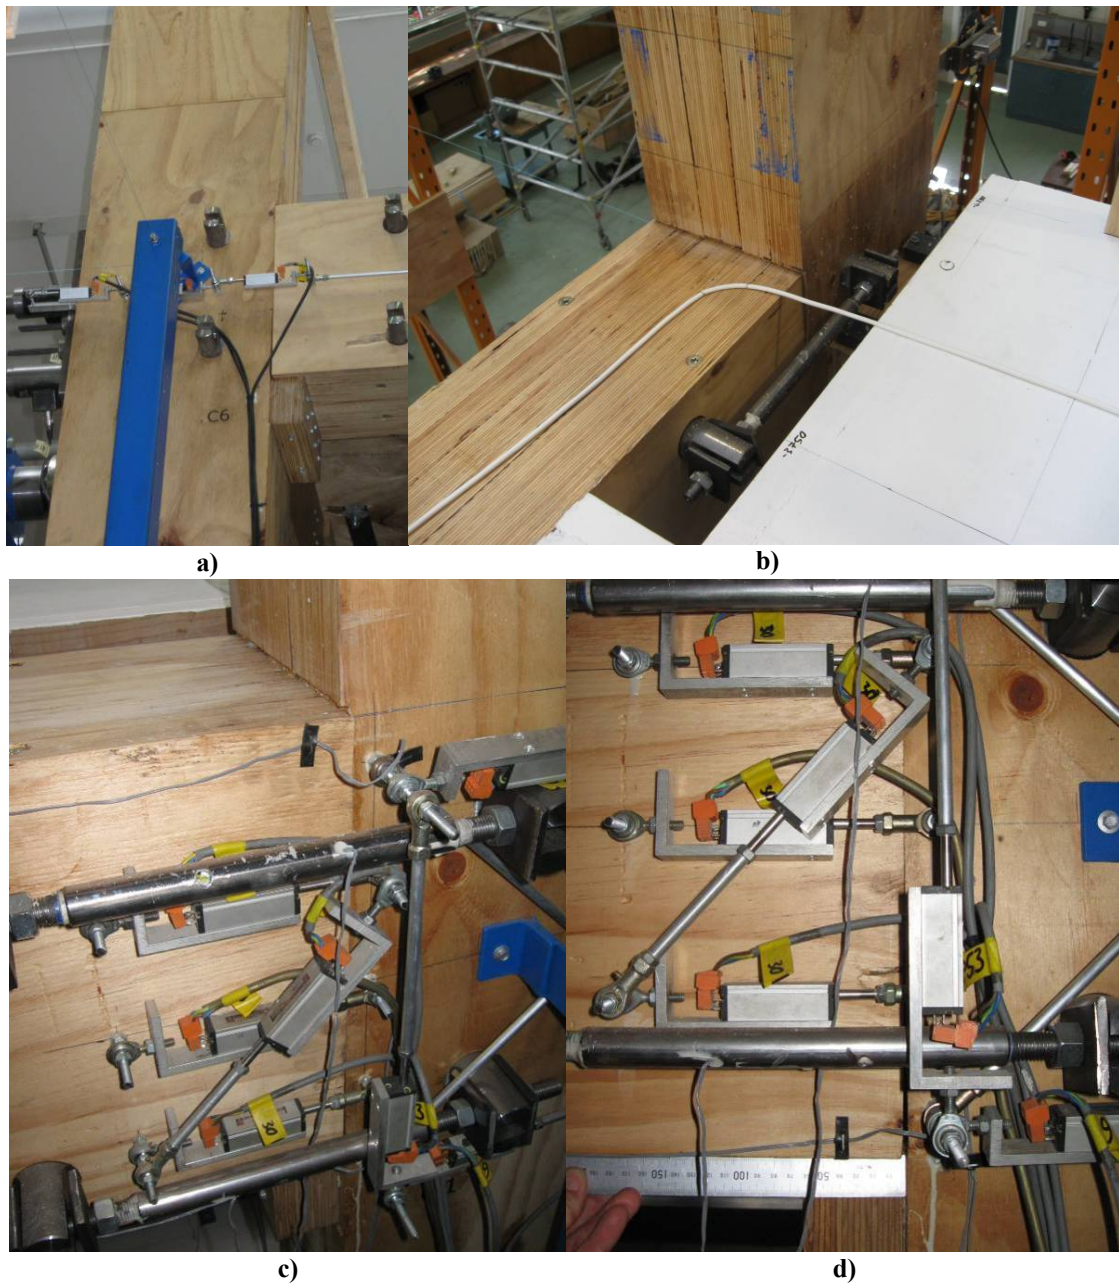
L3 BC connection deformation at 2% Drift for west exterior columns a) SW column, looking up b) SW column, looking down c) NW column, top d) NW column, bottom
